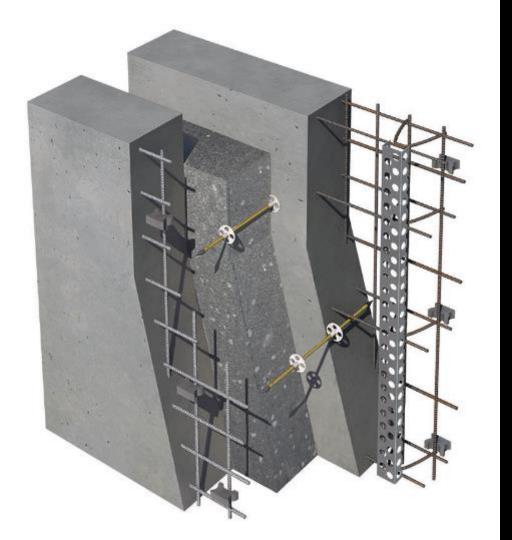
Details MUST be developed to insert a thermal (insulation) break between the exterior and interior
